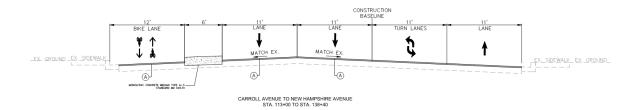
Typical Two-Way Separated Bike Lane Section (Facing East)
